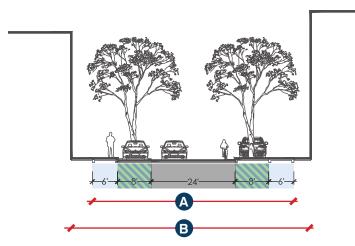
FIGURE: PRIVATE STREET SECTION W/ LANDSCAPE/PARKING ZONE
